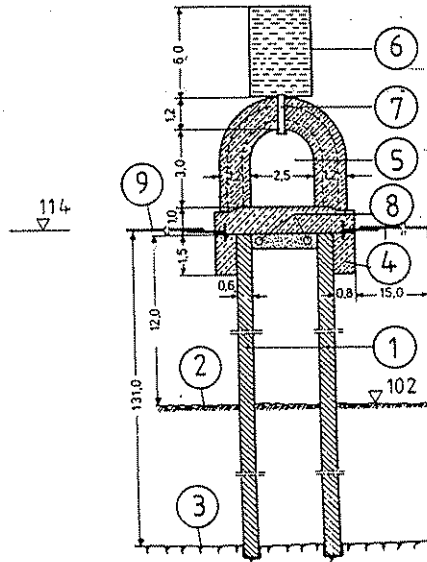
Manicouagan 3 gravel dam. System of substrata sealing, consisting of two diaphragms of intersecting piles with gallery structure on top, penetrating into the dam core (adapted from Lorenz 1976).
